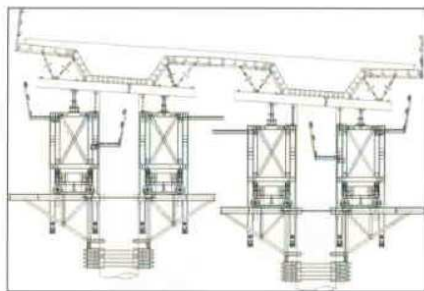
Elevation and plant view of OPS movable scaffolding system¹⁴
